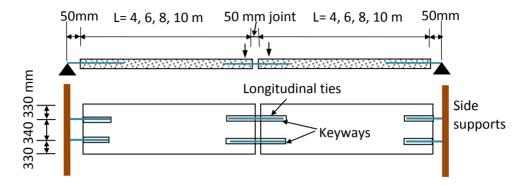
Illustrative diagram of the full scale floor-to-floor joint tests
